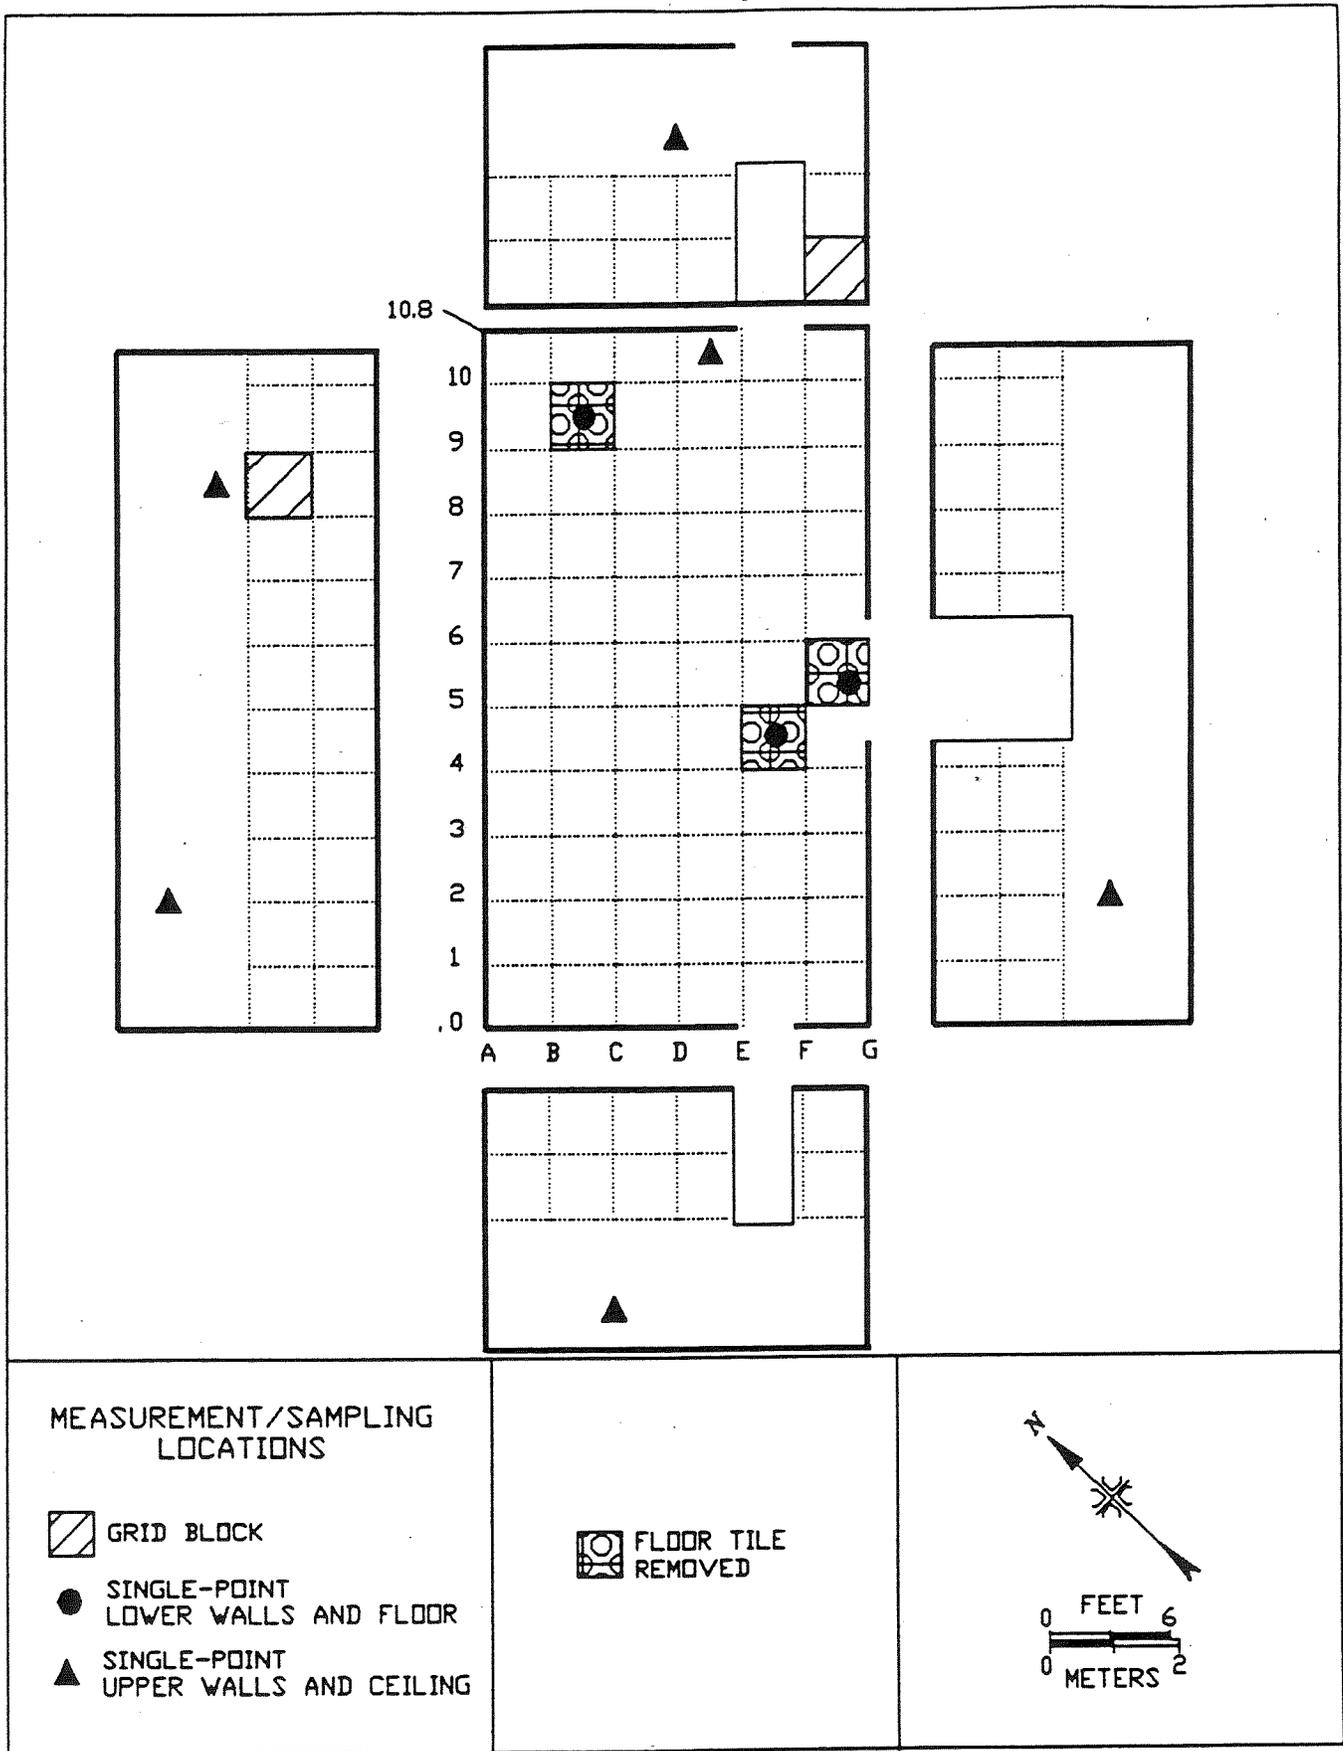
Building 005, Room 110 - Measurement and Sampling Locations
